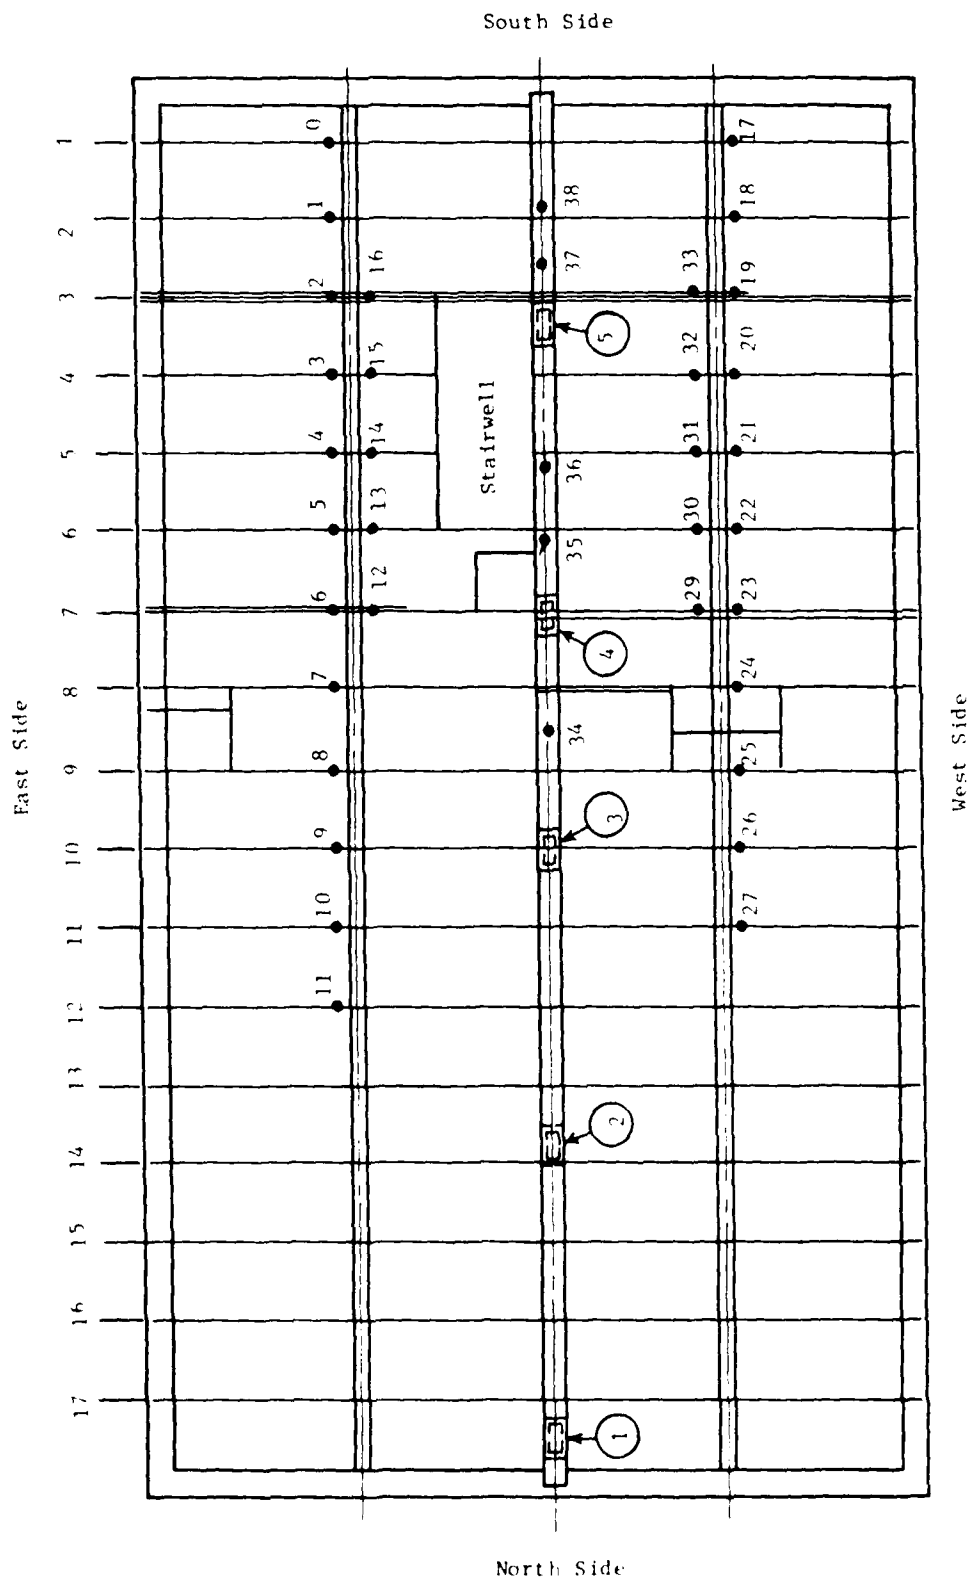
Deflection Measurement Instrumentation Layout, Second Load Test
